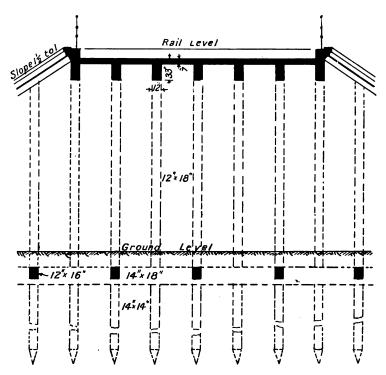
Victoria Street Bridge, Bristol. Cross Section.
